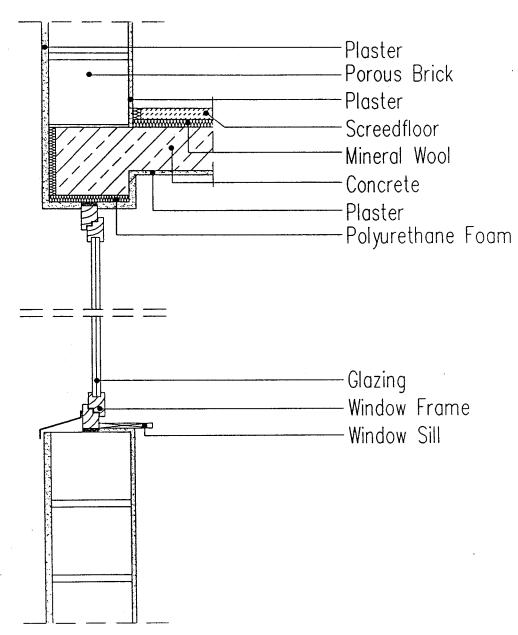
shows a typical masonry or brick building system. The walls are constructed with low-conductivity brick. For structural reasons the floors need to be constructed of medium density concrete. To reduce heat loss at wall floor junctions, 25 mm of polyurethane foam insulation is used. The roof is a wood frame assembly with 120 mm of mineral wool insulation.
